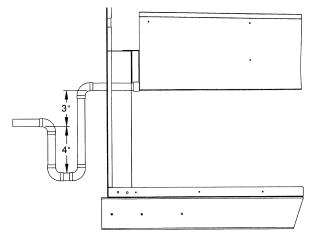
Condensate Drain Trap Piping Details (Typical Roof Curb or Slab Mount Shown)
